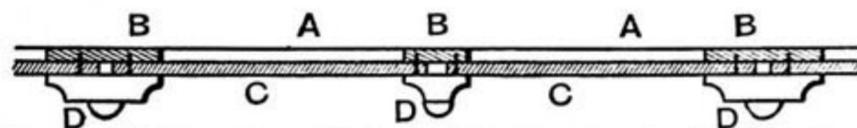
Wall Panelling. Horizontal Section, showing Construction.
